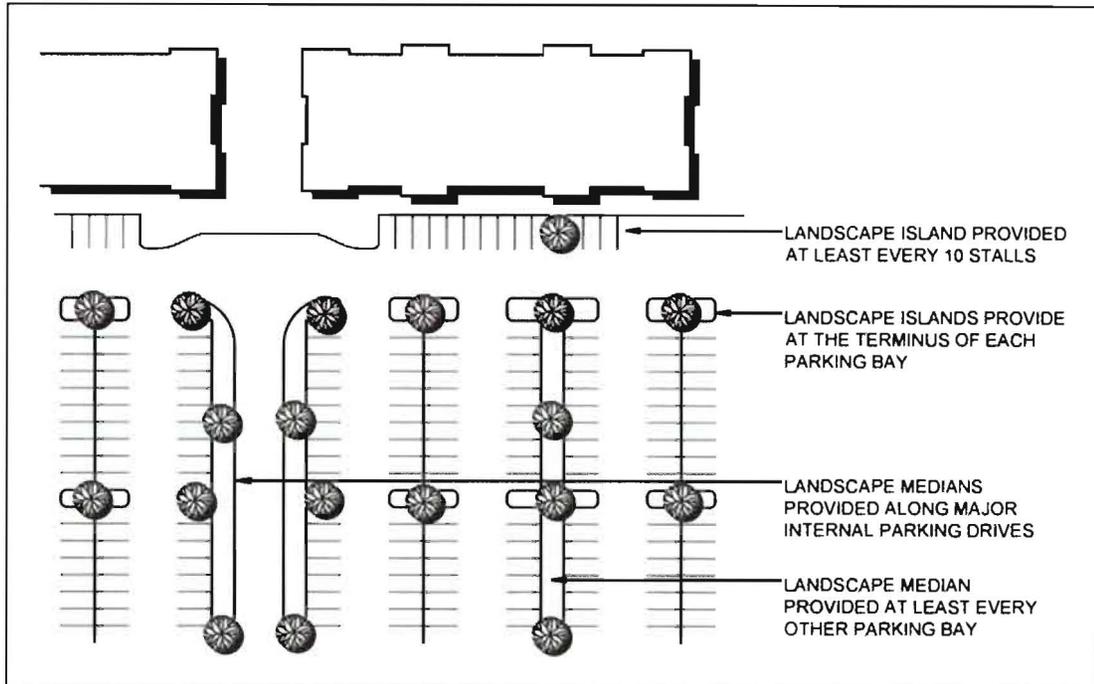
D-1, Example of Large Parking Lot Layout and Landscaping
